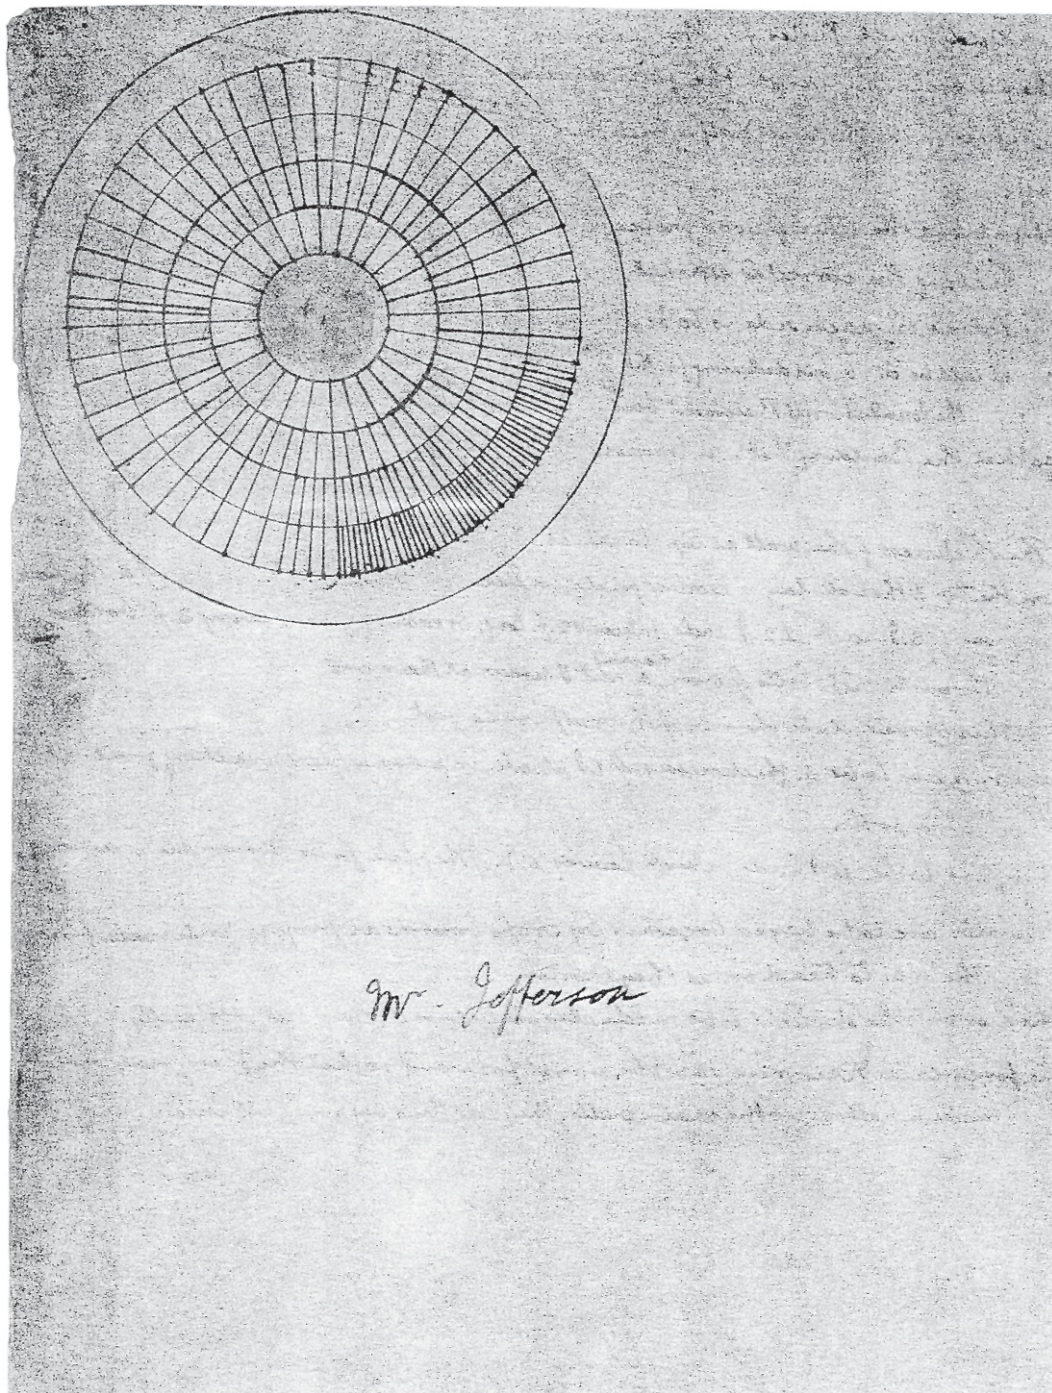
Jefferson's drawing of the framing plan for the Rotunda Dome. [Jefferson Papers]
